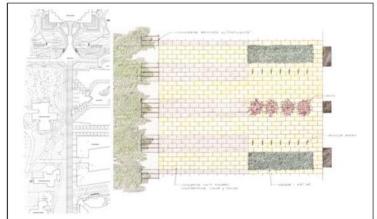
Sketch plan, c. 1990s (PWP Landscape Architecture)
